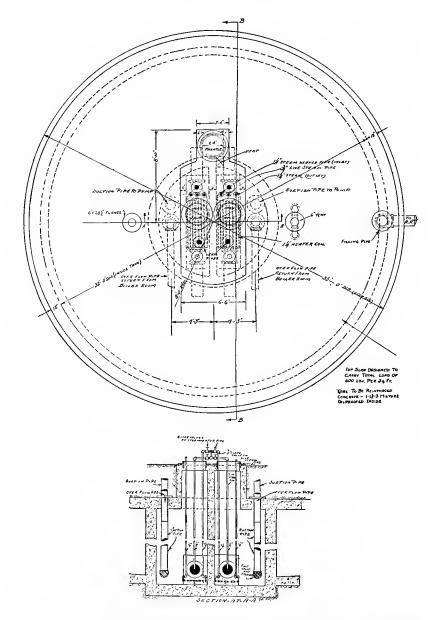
Diagram showing central compartment with piping, heaters, etc., in cylindrical concrete tank.
